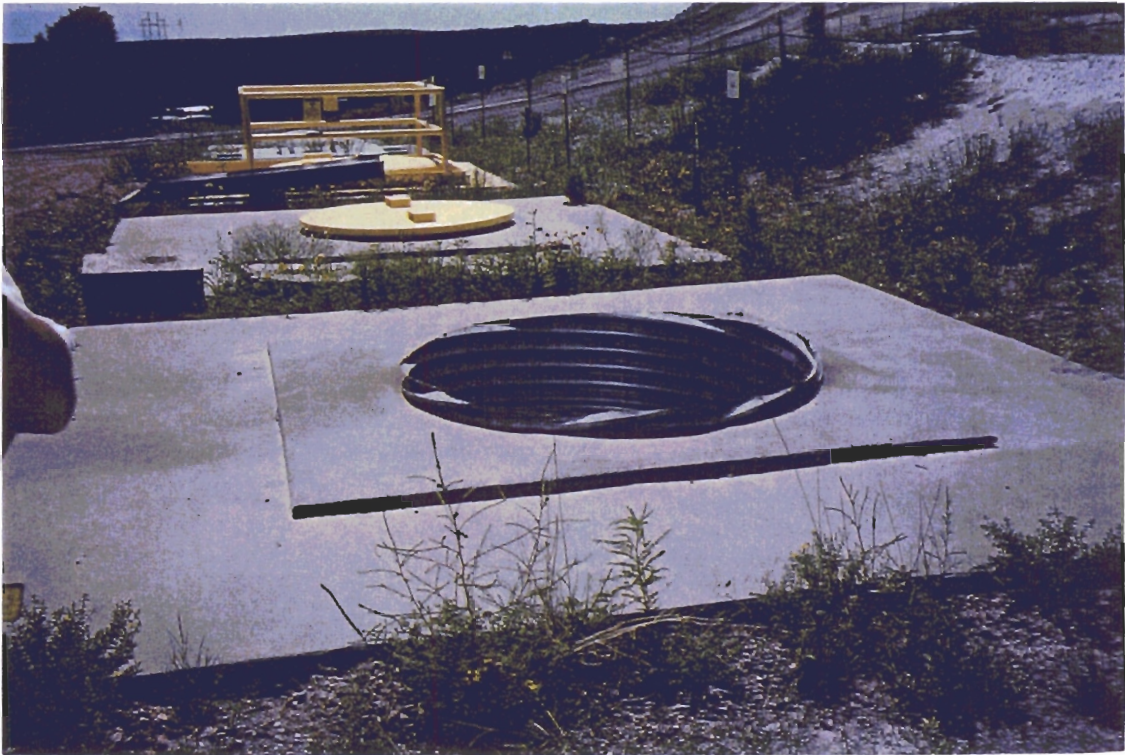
Surface View with Operational Cap Removed, Storage Shaft 145
